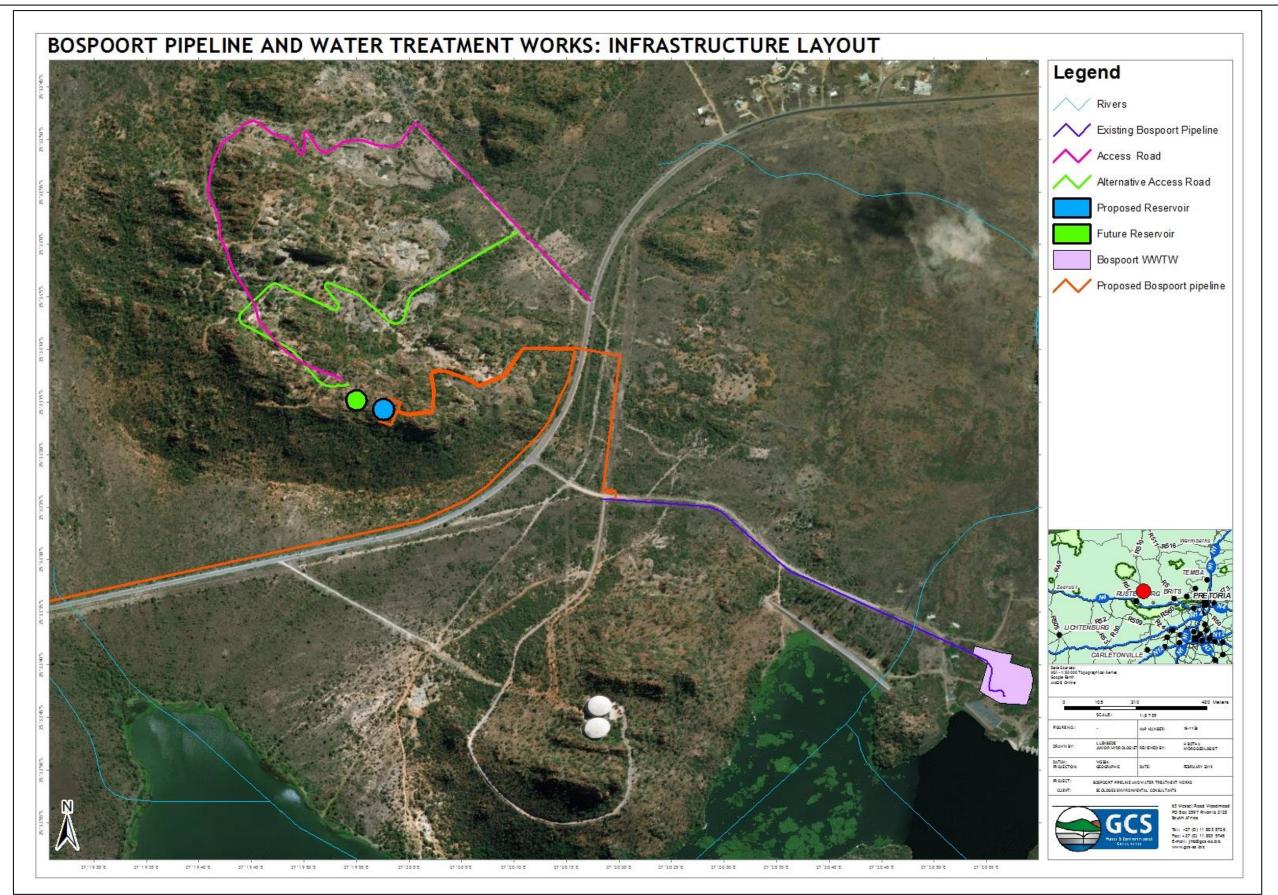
Layout plan for the proposed infrastructure at the Bospoort site
